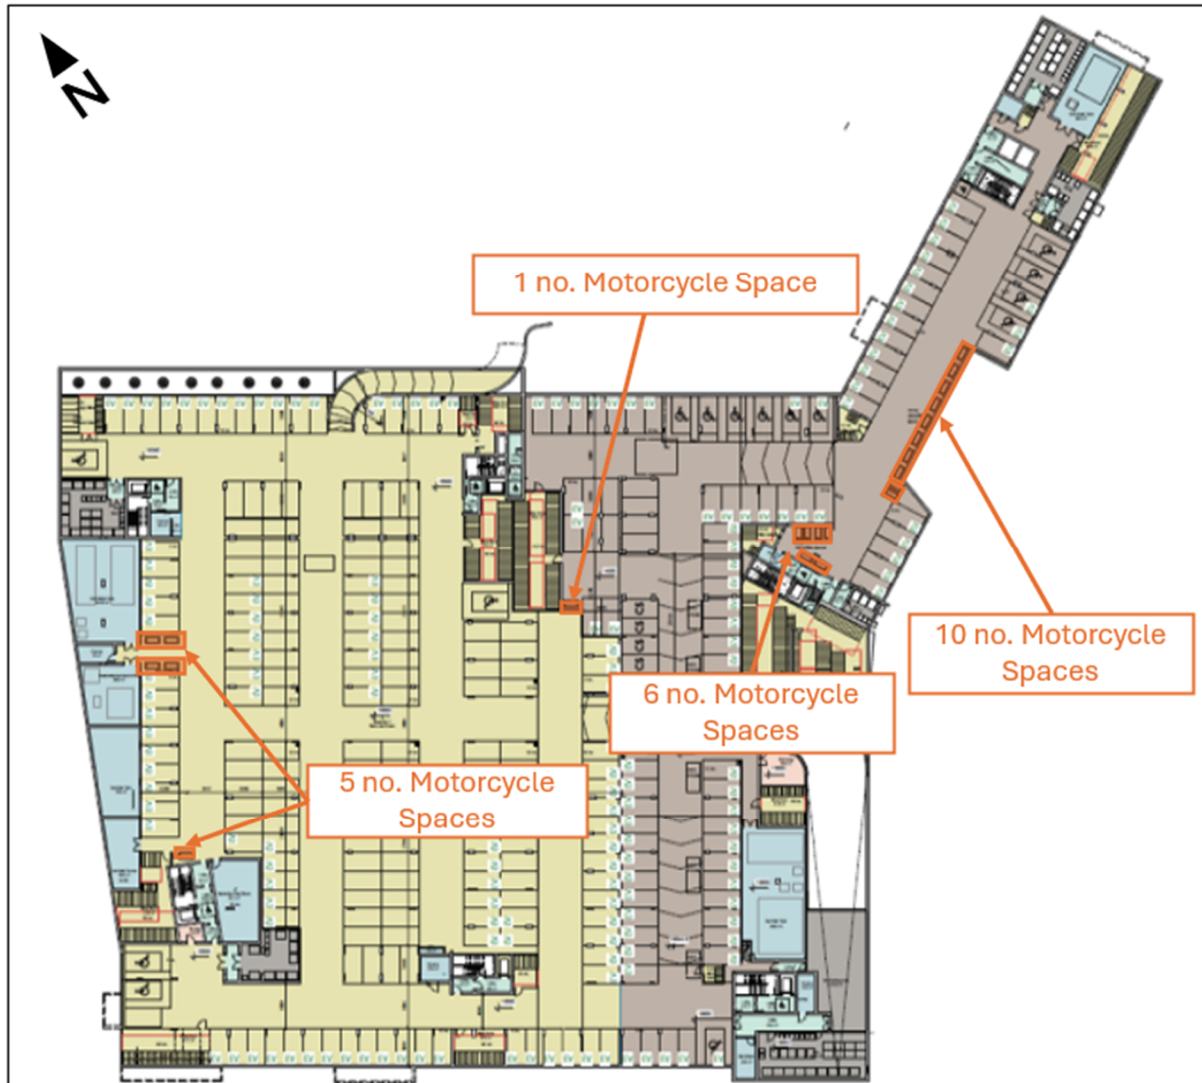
Motorcycle Parking Spaces at Subject Site
